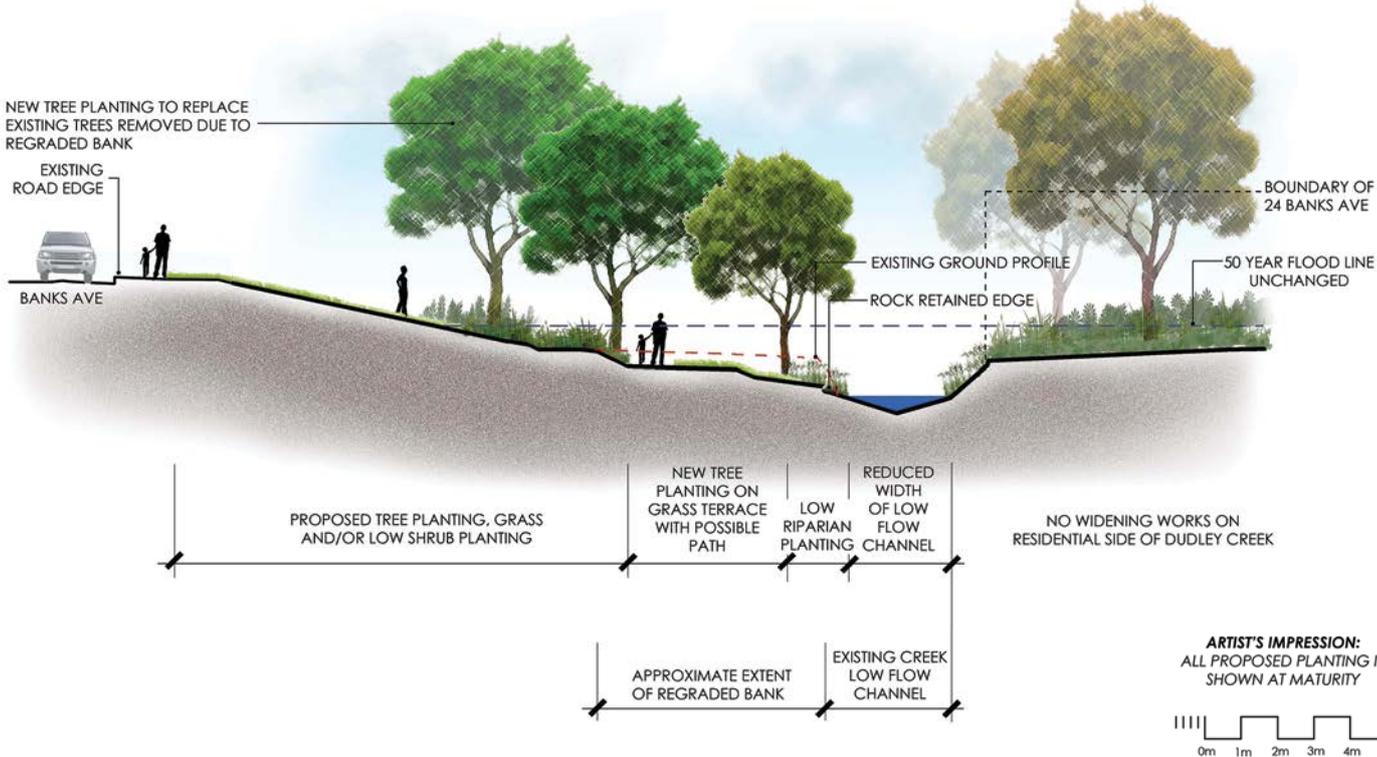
Downstream Option A – Cross Section C (looking downstream from 32 Banks Avenue)
